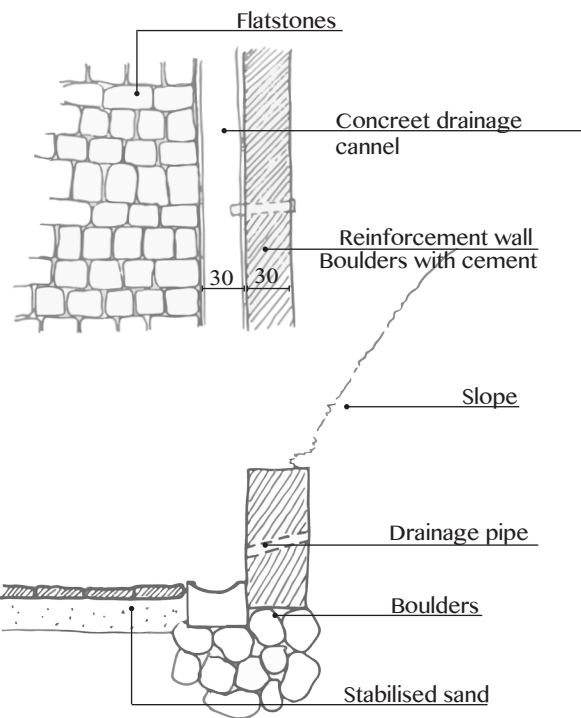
Detail H Typical retaining wall and water drainage, Scale 1:50, dimensions in cm
